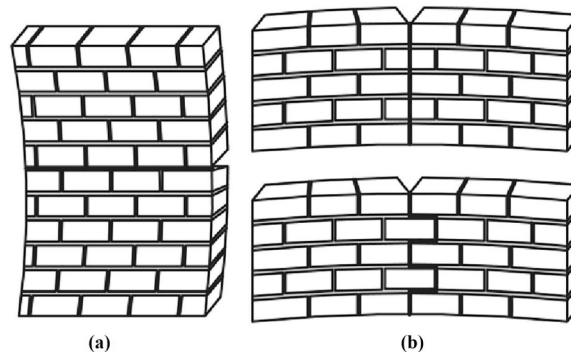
Out-of-plane failure with failure plane: (a) parallel to bed joints, (b) perpendicular to bed joints [4].
